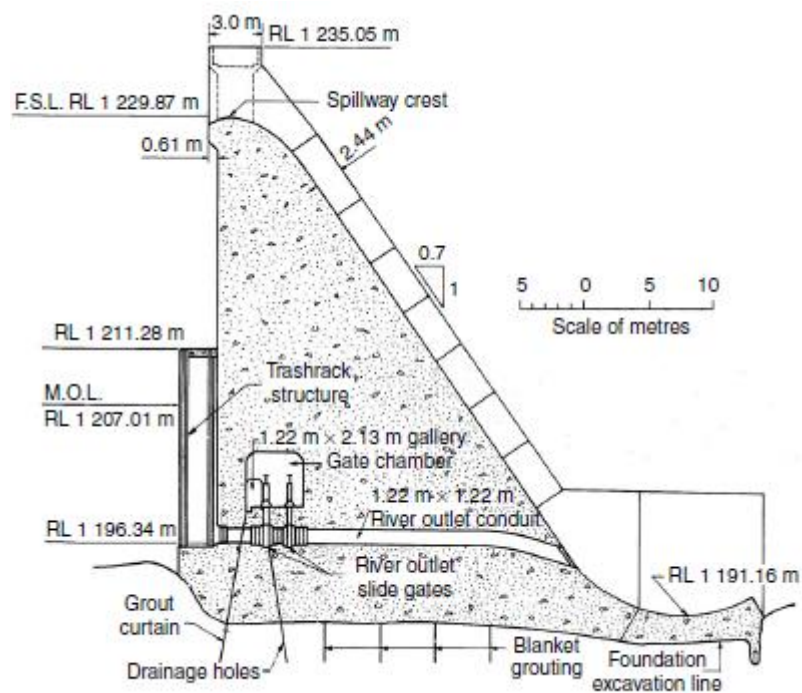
2: Typical concrete gravity dam cross section (Fell et al., 2014)
